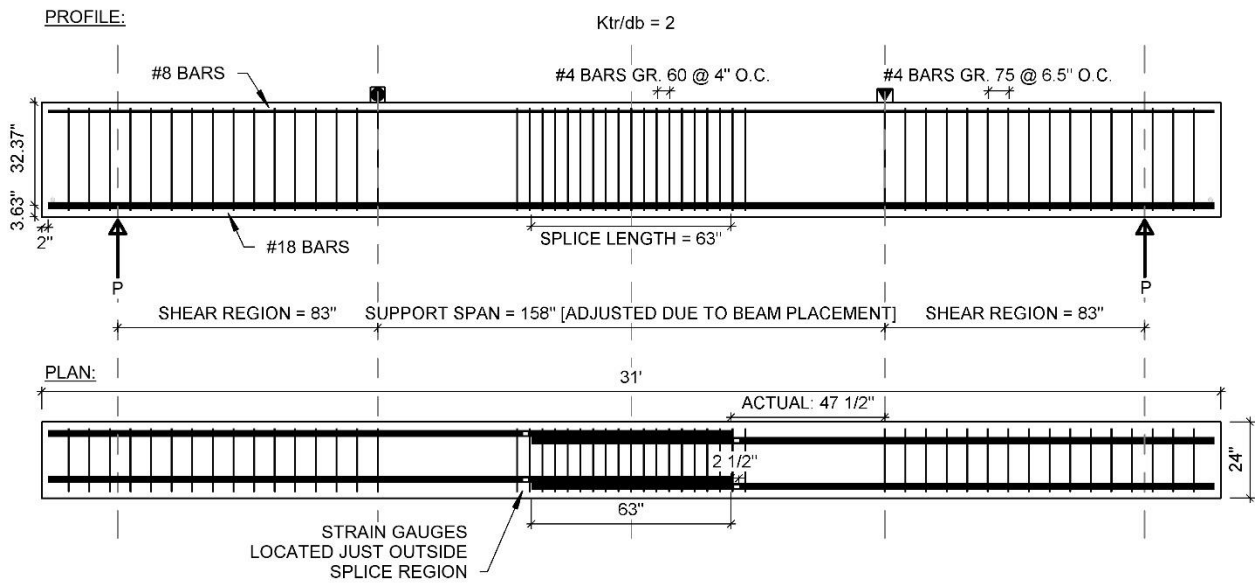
Profile and plan of 18-b (1 in. = 25.4 mm)
